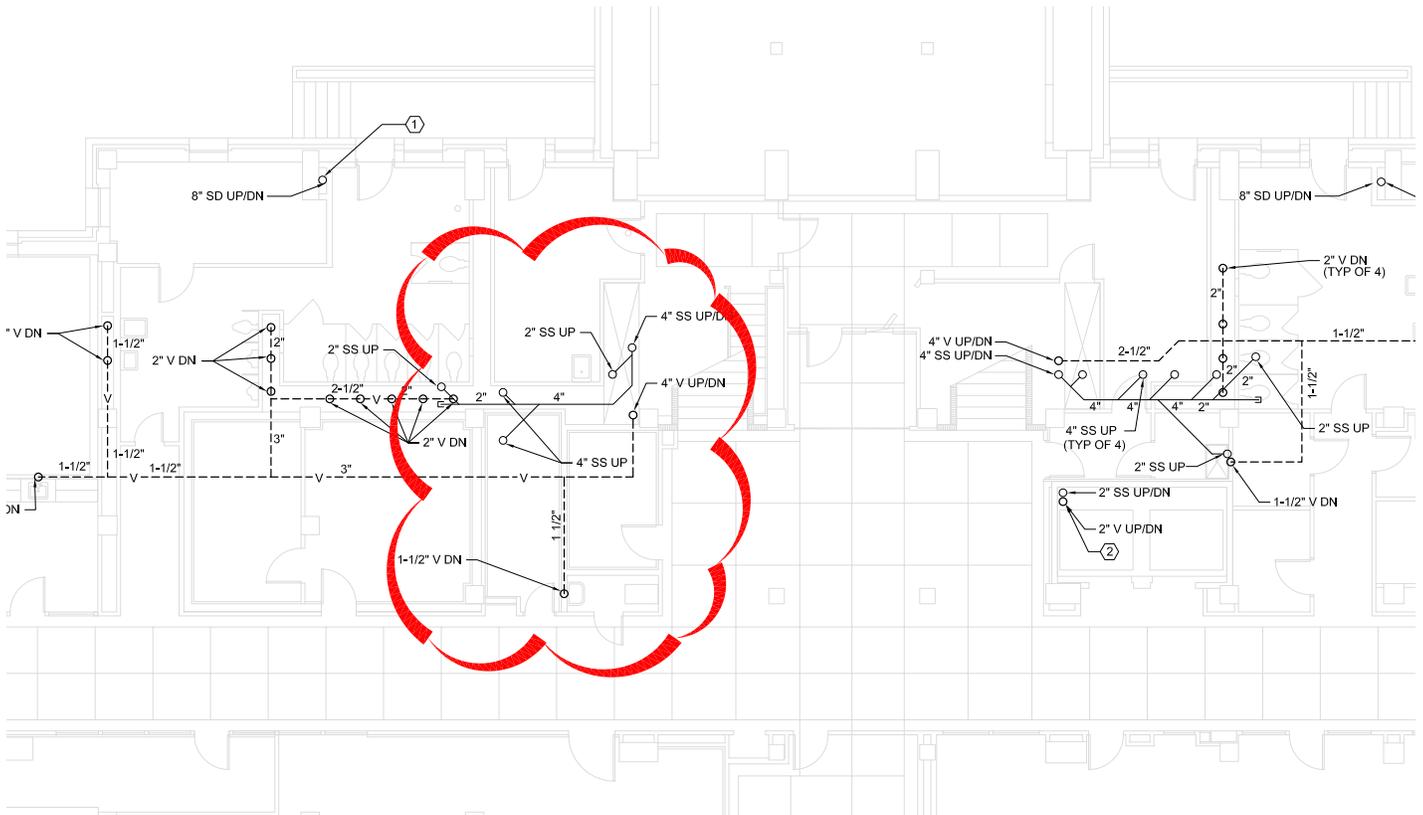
First (Ground) Floor - Location of Previous PVC Sewer Line Repairs
